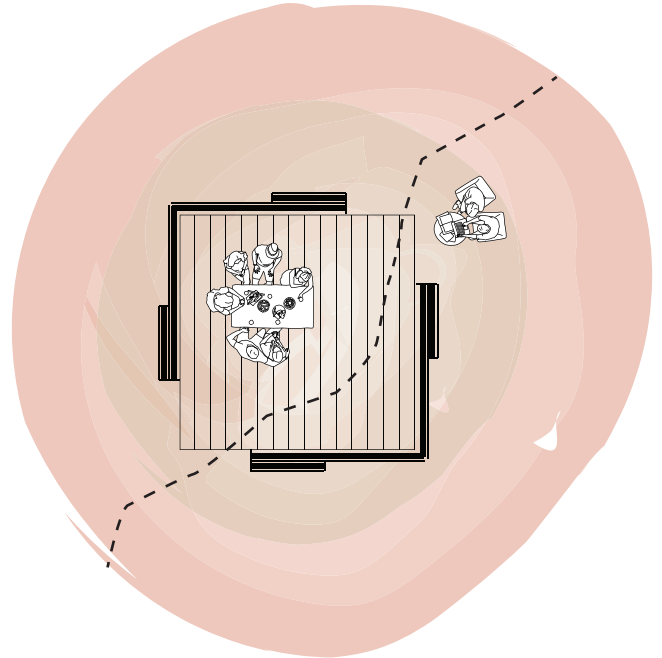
Test model showing the corners of the building folding back as if 'dissolving' and therefore blurring the boundary between inside and outside.
